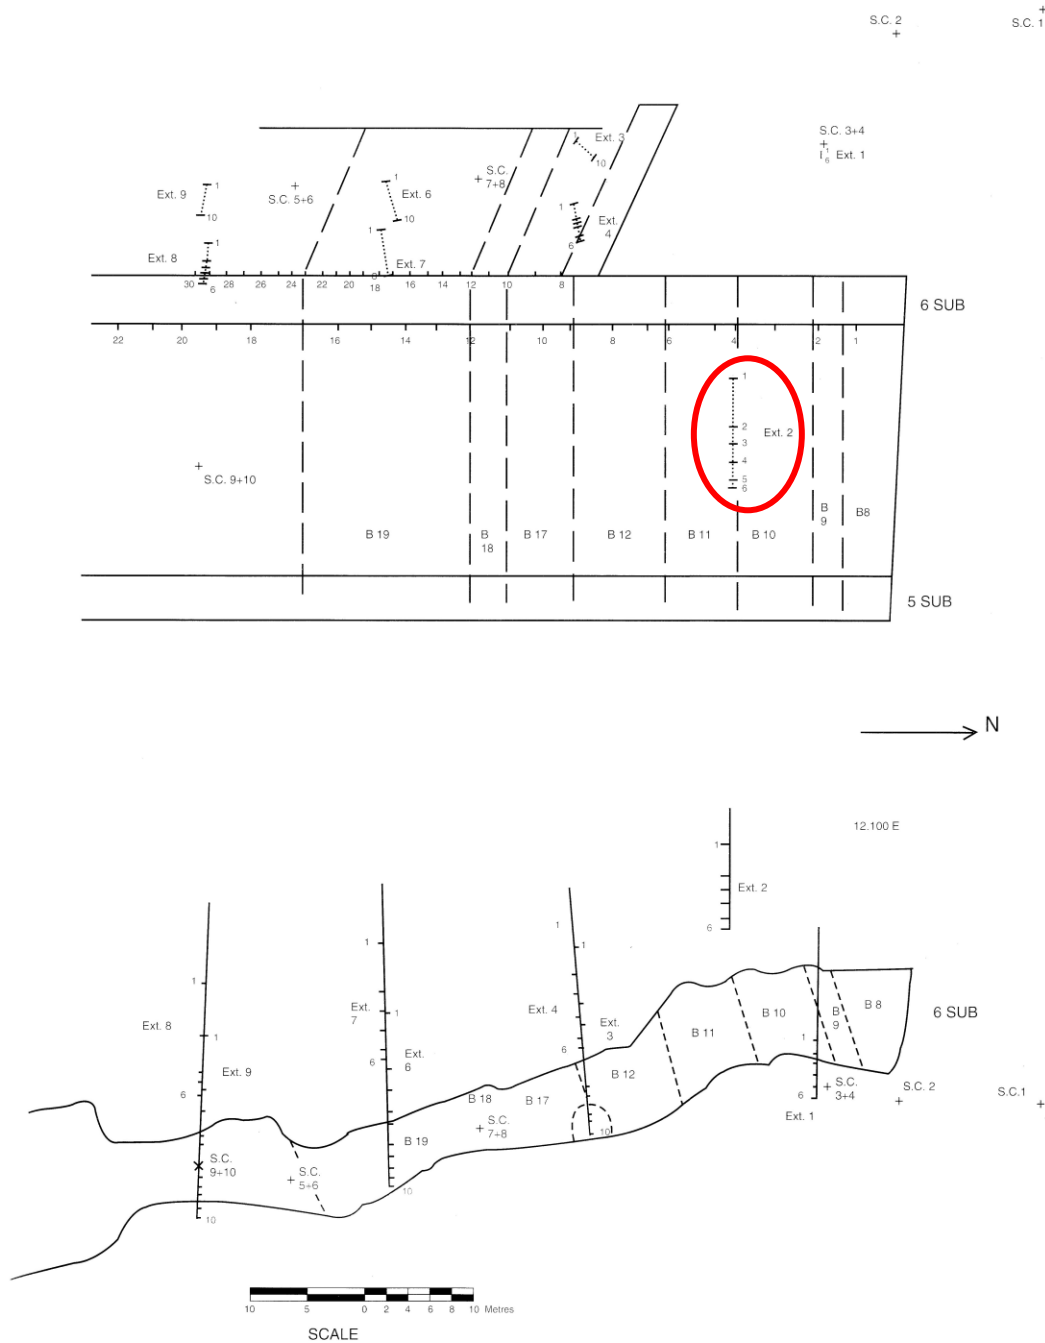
Long view and plan section of the 16N stope hanging wall at Brunswick mine showing the major blast extents and instrumentation locations (from Hudyma et al, 1993).
